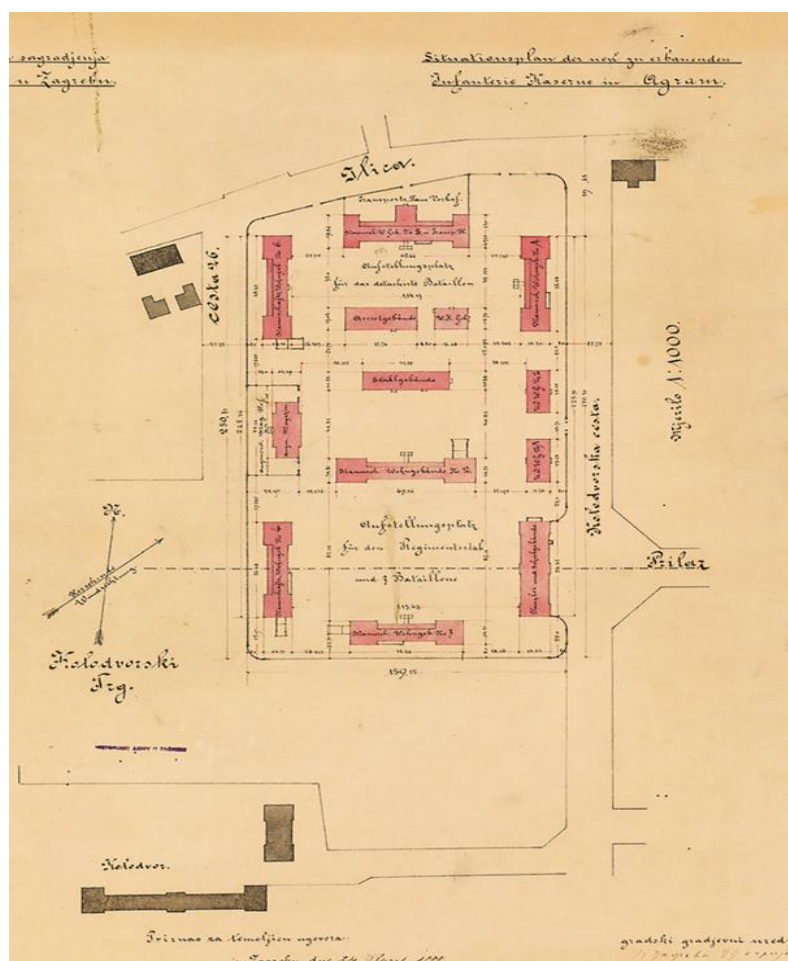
Layout plan of the Infantry ("Prince Rudolf") Barracks ("Layout plan for the purpose of building a new infantry barracks in Zagreb") from 1880.
